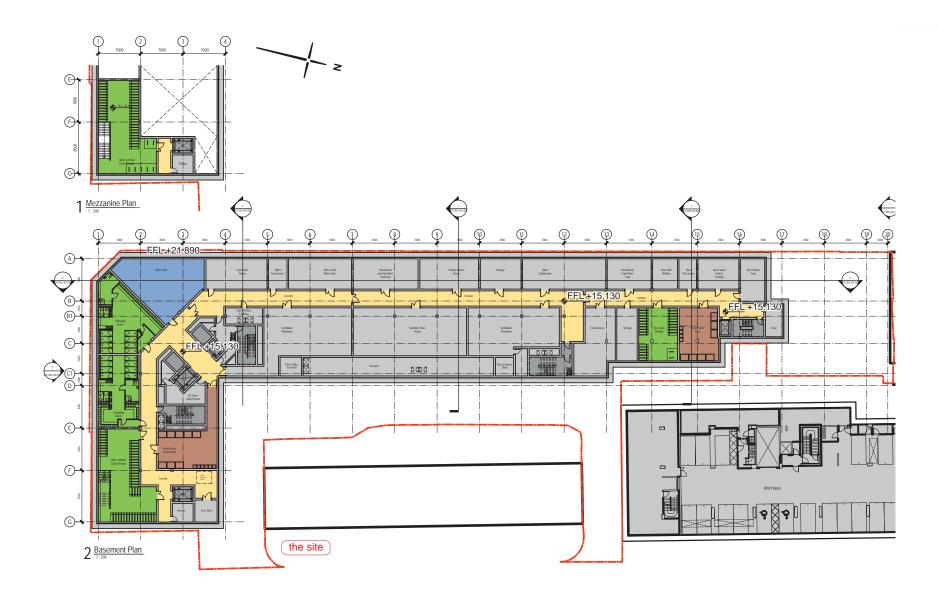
Plan of proposed basement floor, showing proposed floor levels (Foster & Partners, dwg. no. A-P-031-B1-00-001, rev. 01, date 28/08/2019)
